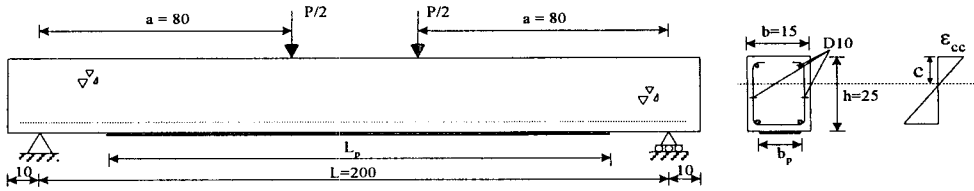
Loading configuration and cross section of RC beam(unit : cm)
